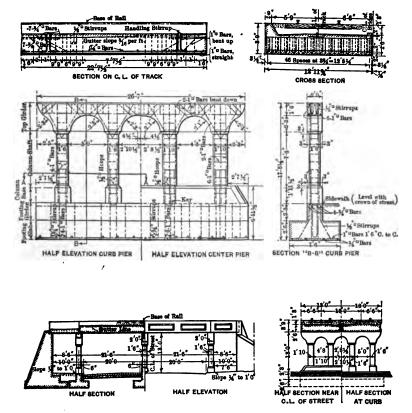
Reinforced Concrete Subway, C. M. & St. P. Ry.
